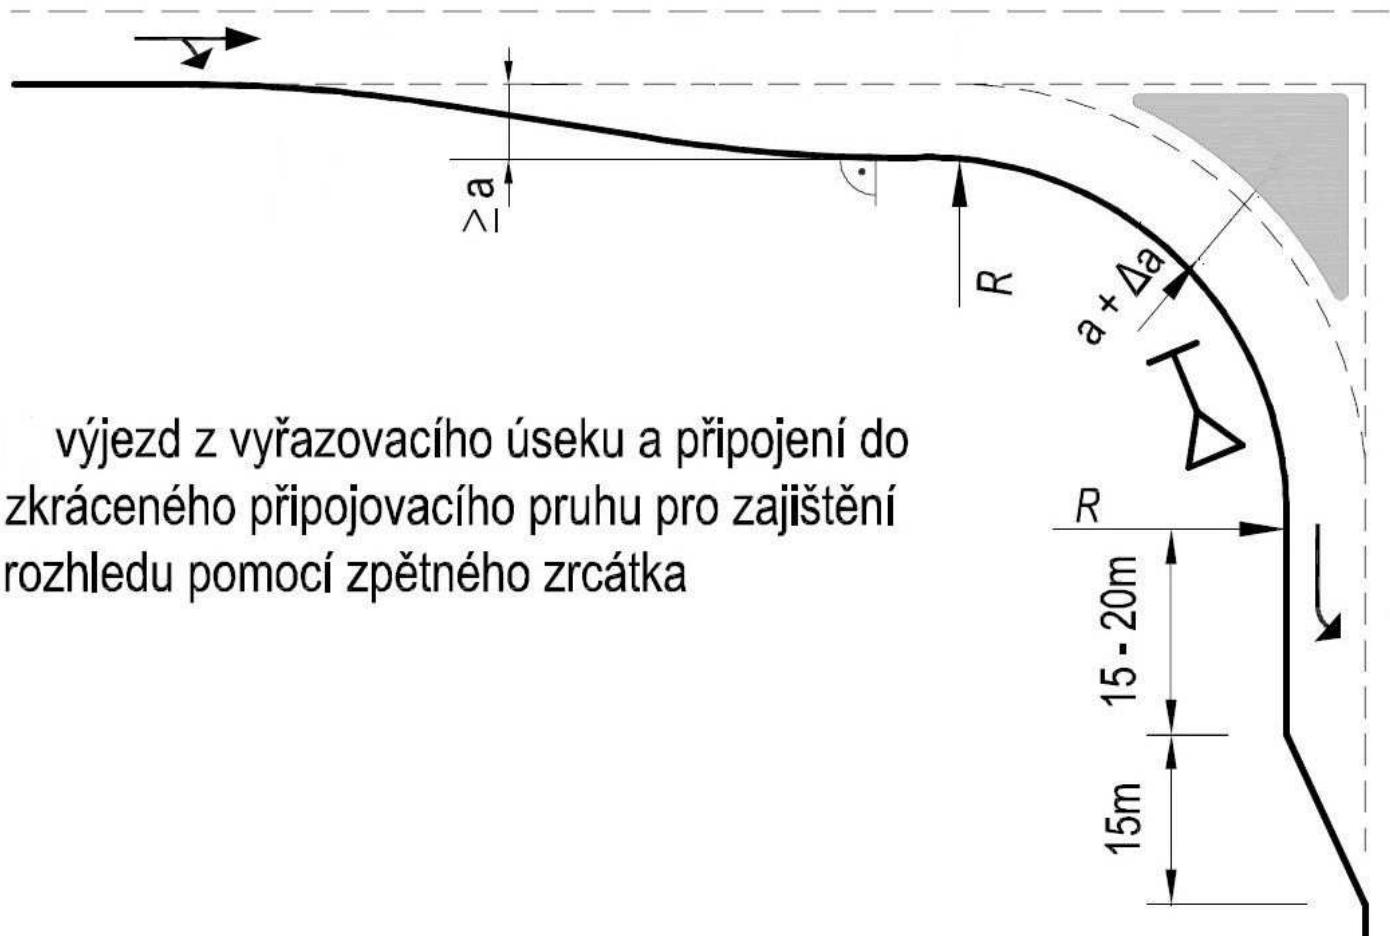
(at-grade junction connector with connection to shortened merge lane)
